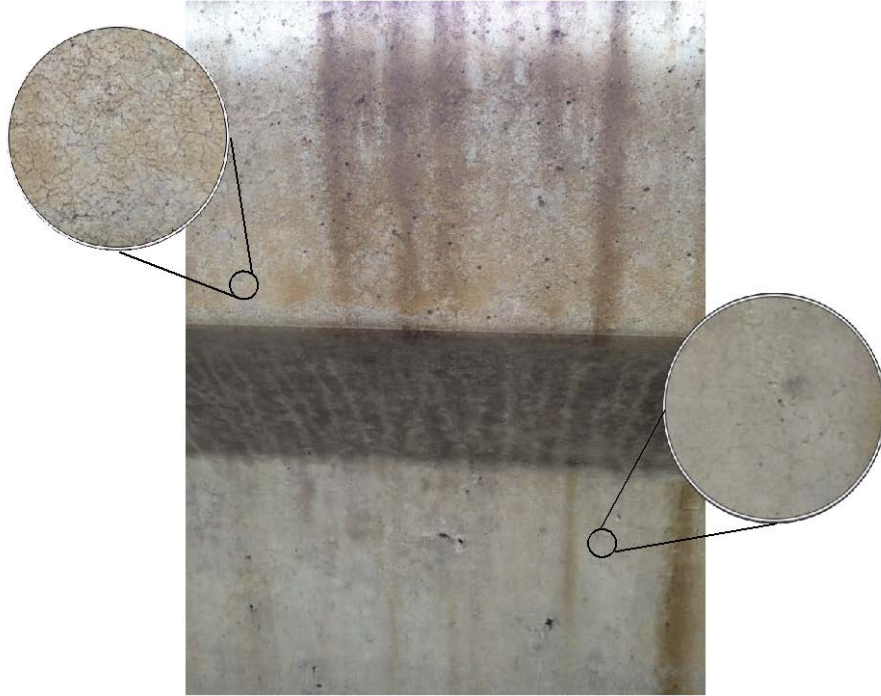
Girder located at Precast Plant PP-A (micro-cracking concentrated on upper and lower flange)
